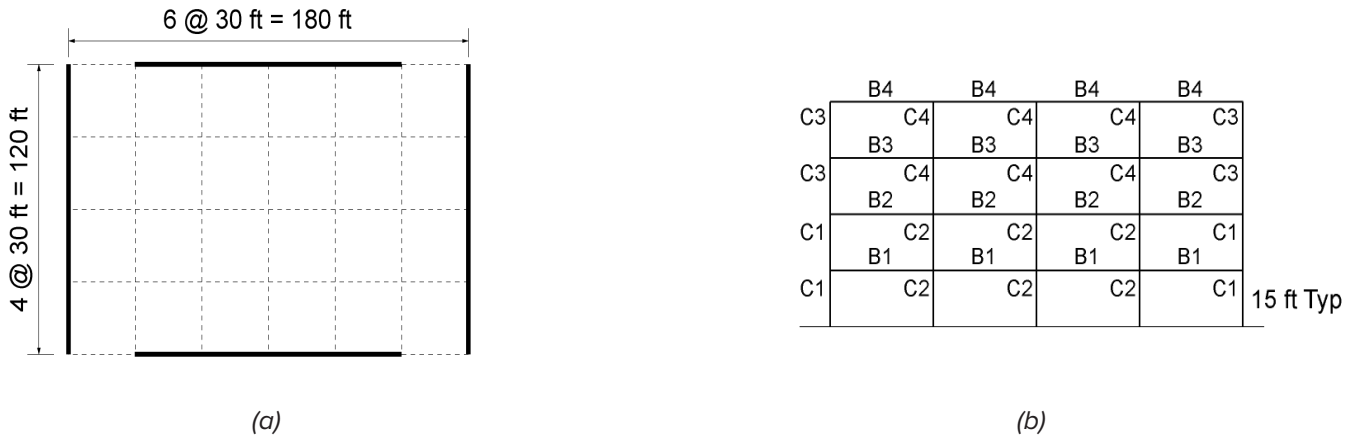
Prototype structure: (a) plan; (b) elevation of typical SMF.
